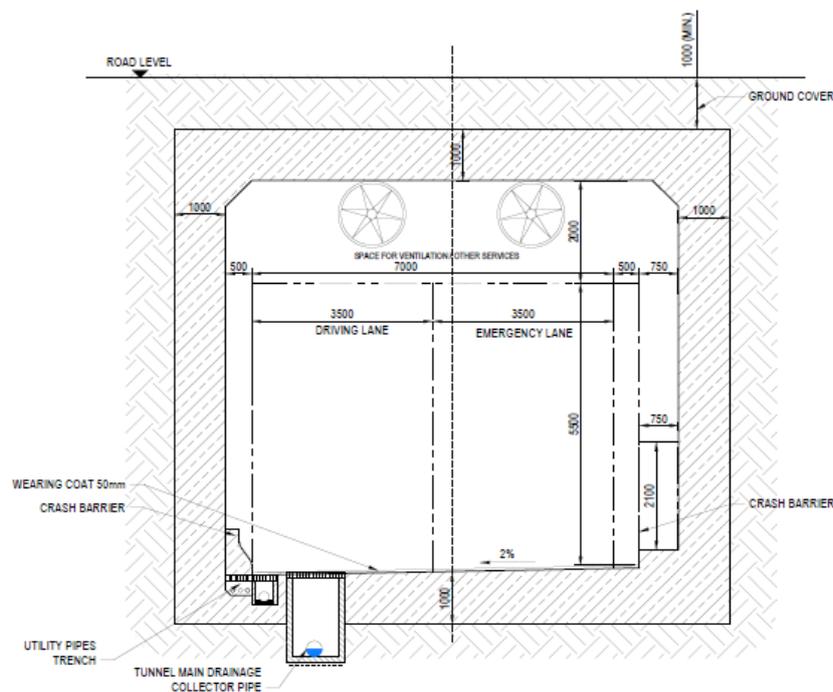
Typical Cross Section C&C Structure (2 LANE)
